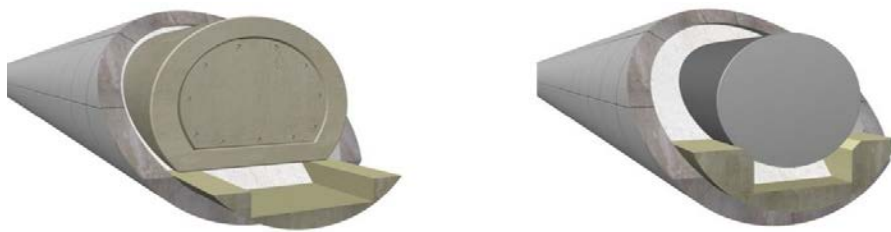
Backfilled gallery section of a category B and C waste disposal gallery
